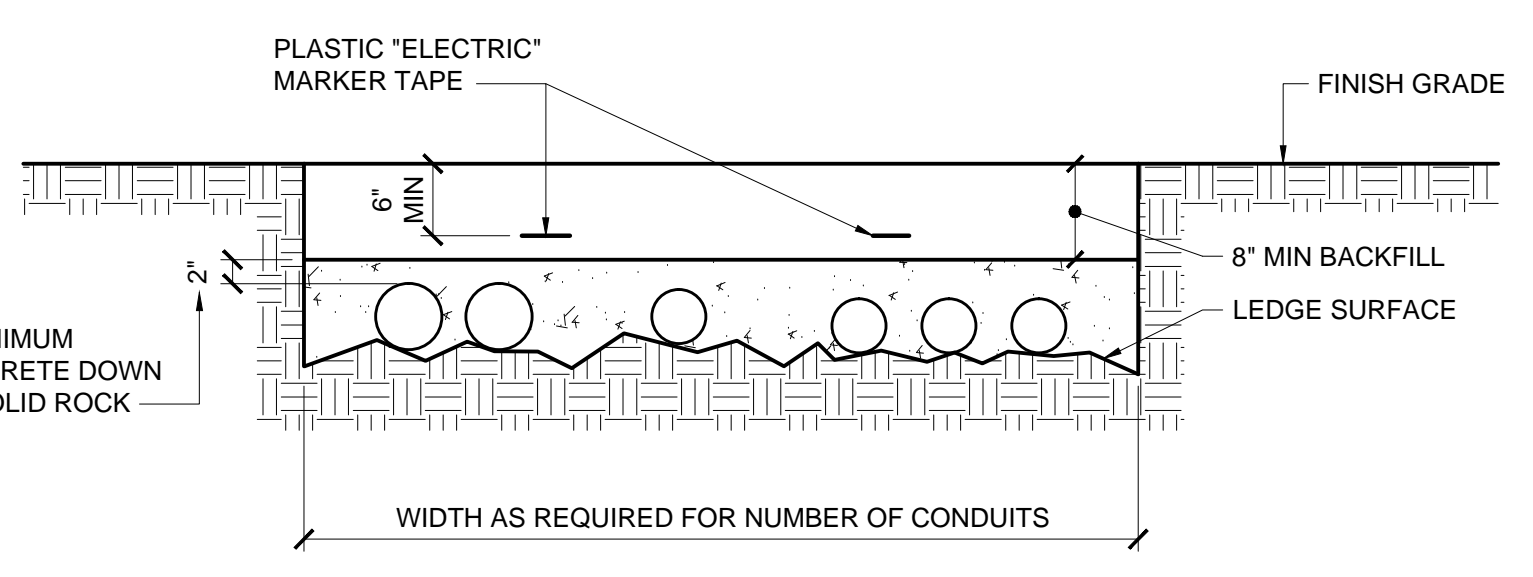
DETAIL INDICATES TYPICAL SPACING BETWEEN CONDUITS OF VARIOUS SYSTEMS, REFER TO SITE PLAN FOR SIZES AND NUMBER OF CONDUITS
